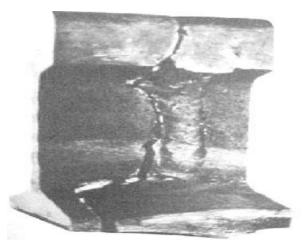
431 - WELDING, ELECTRIC ARC JOINT TRANSVERSE CRACK
